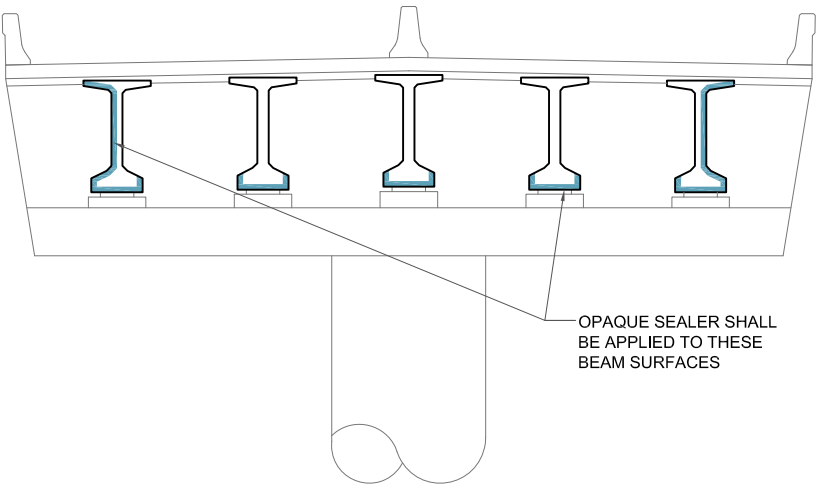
Required surfaces for aesthetic treatment on concrete beams
